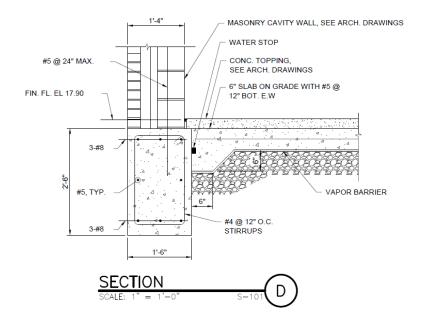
Section (D) 18" Grade Beam-Proposed Design
